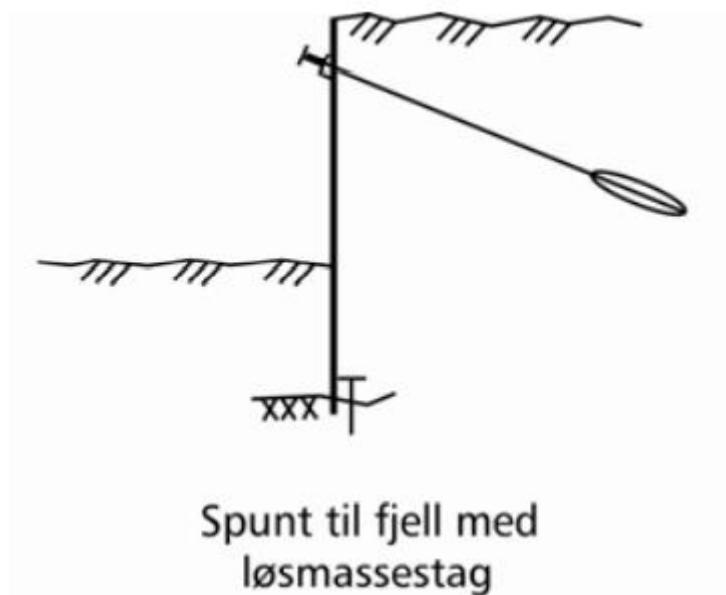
sheet pile anchored to mountain with soft soil scruts. taken from handbook 016 page 10-3
